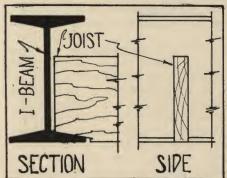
Wood Joist Resting on Flange of Steel Beam Where Heavy Beams with Wide Flanges Are Used.
